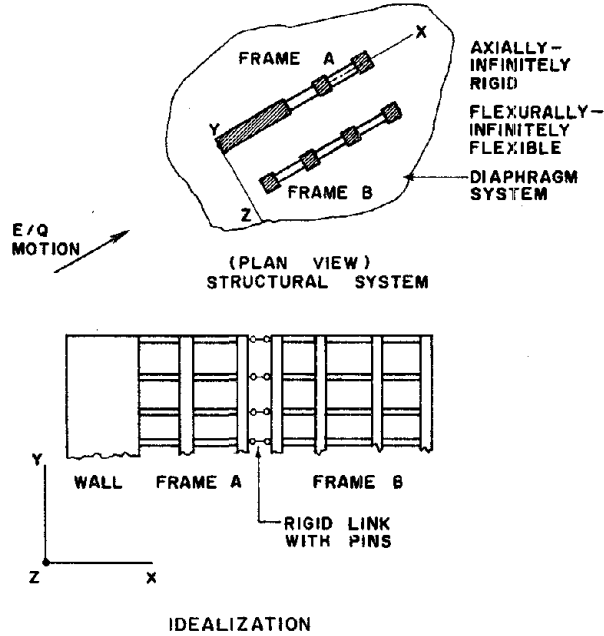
MODELLING FRAME-WALL INTERACTION AS A PLANE PROBLEM
